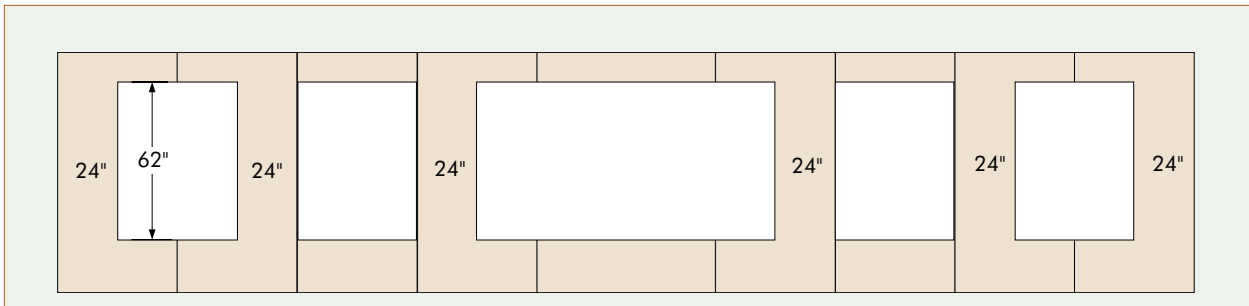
Panel layout detail of east wall for Tests 5b(C) and 5d(8C). Test 5d(8C) had an 800-lbf hold-down device at the corners of the house.
